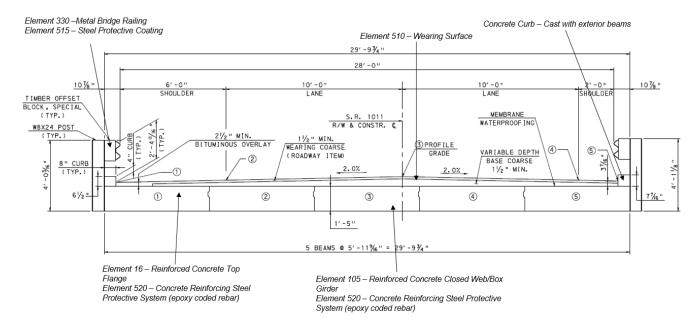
Typical Section of Slab Beam Bridge (looking ahead)
